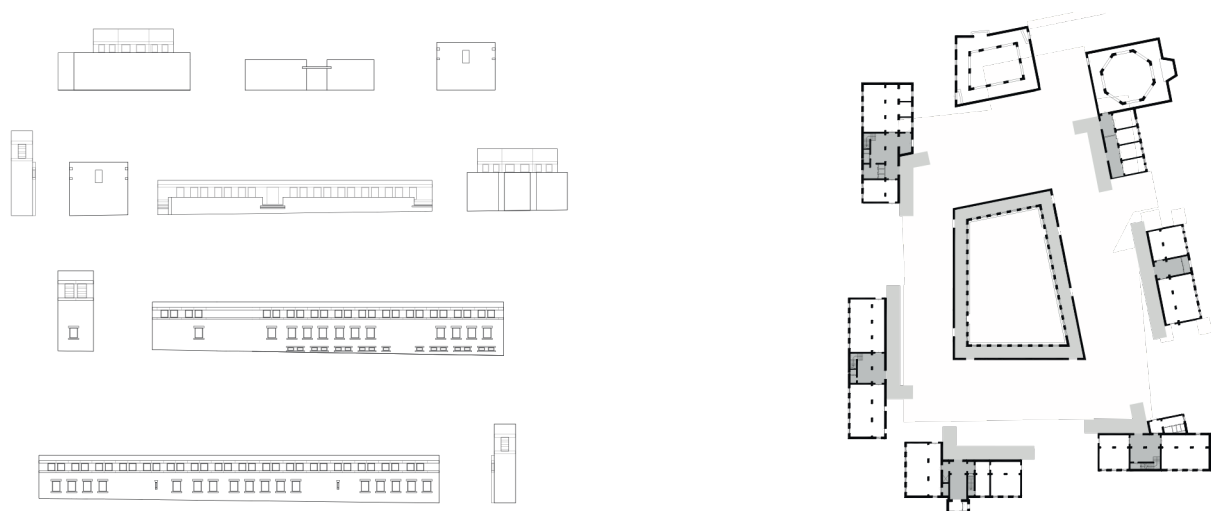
& 26: Isolated volumes in elevations (l) and isolated clusters ground floor plan (r)
